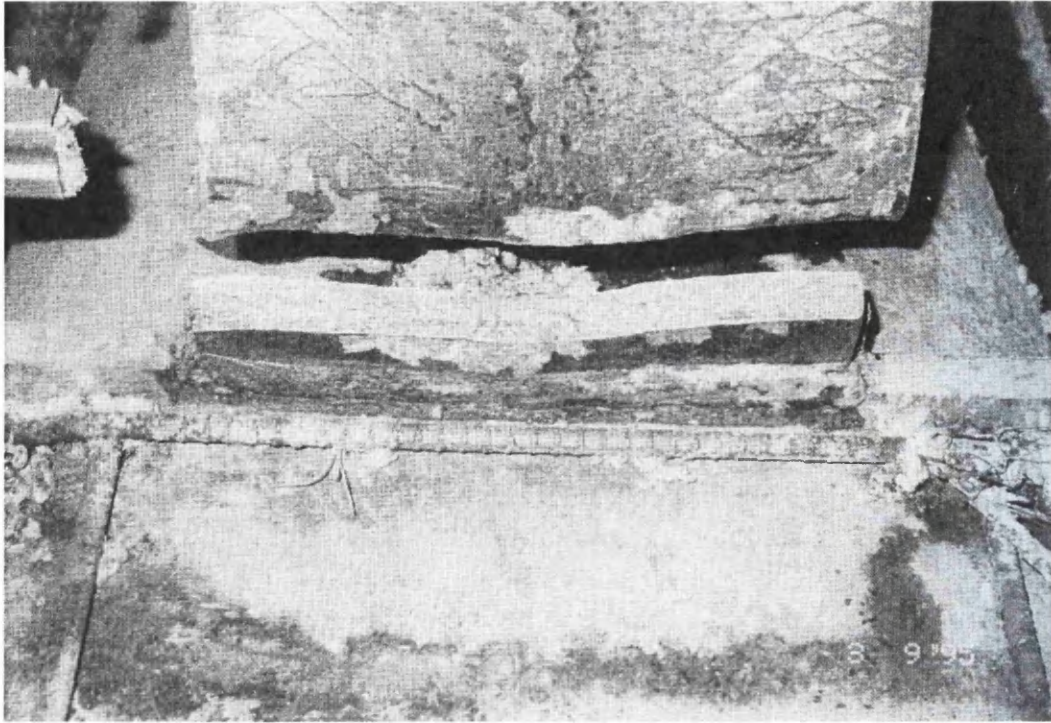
Crack initiated at corner of cope hole ran across flange [Inoue 1995]
